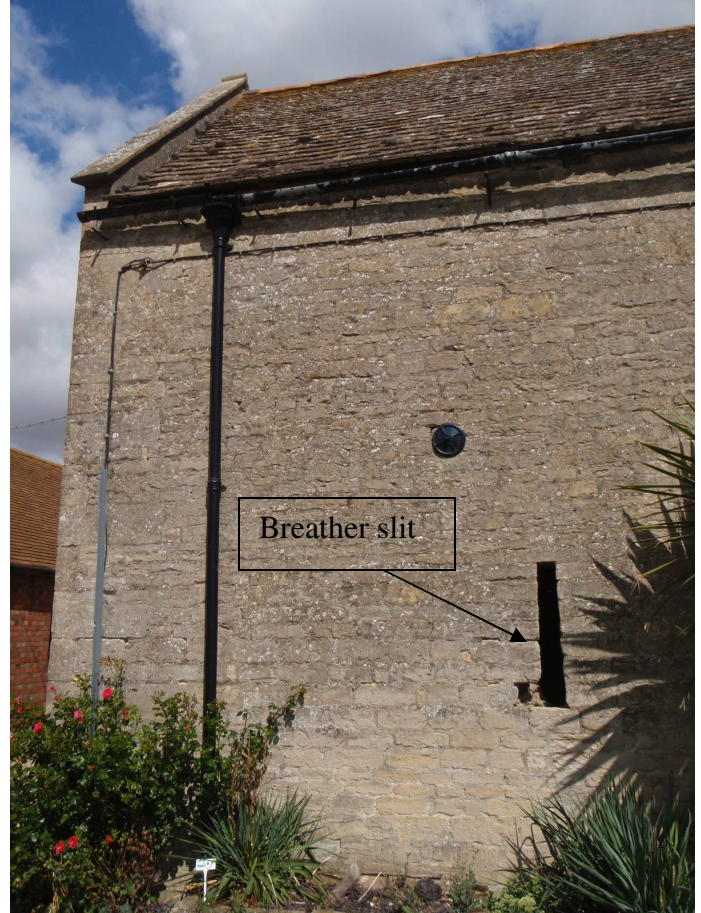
Detail of south elevation of barn showing breather slit, roofing and cross tie plate, looking north
